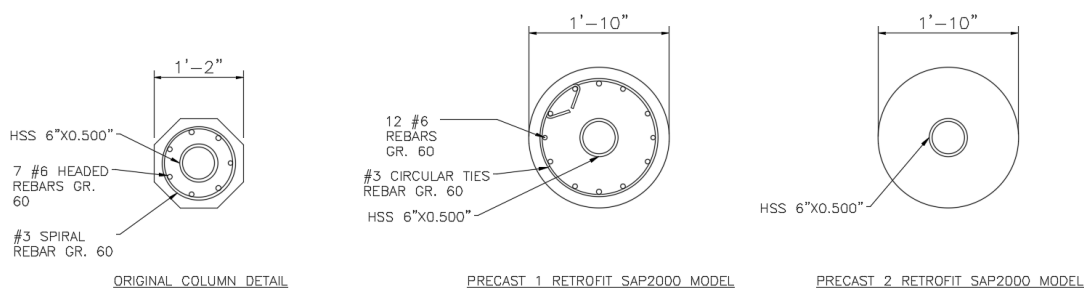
Original Pier, Precast 1, and Precast 2 SAP2000 Cross-Sections
